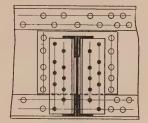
Type of connection of stringers to floor-beams used where floor must be shallow.
